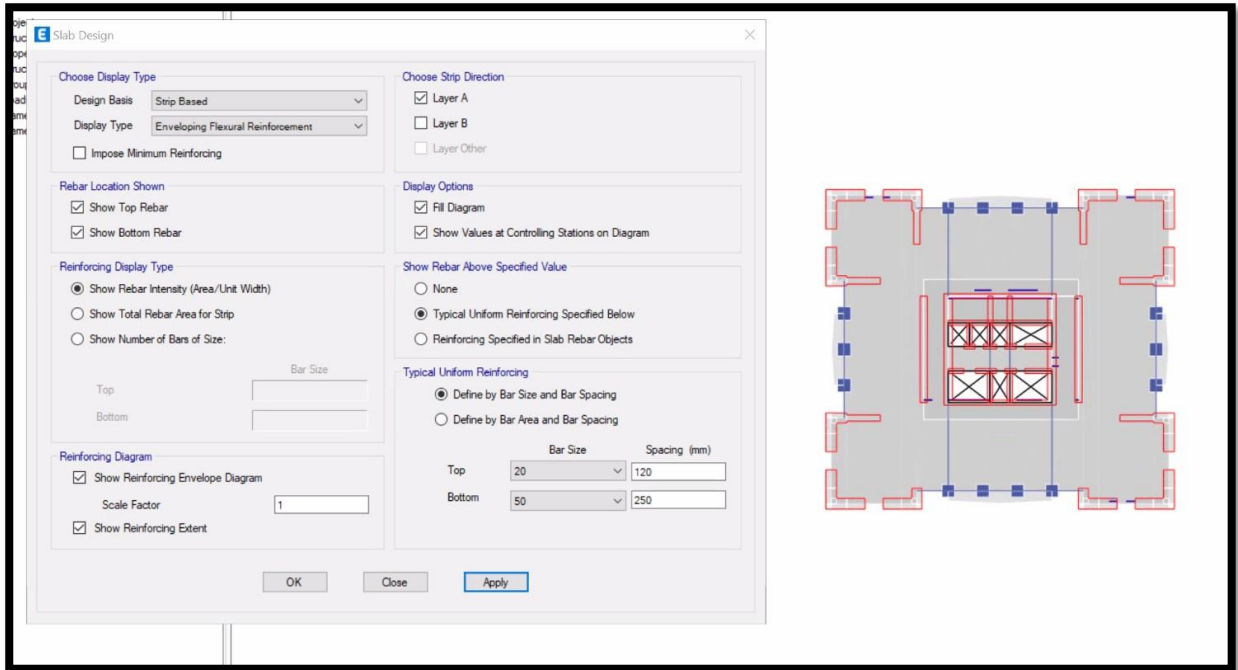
Top Reinforcement in X-Direction for Odd Zones in 8th Floor
